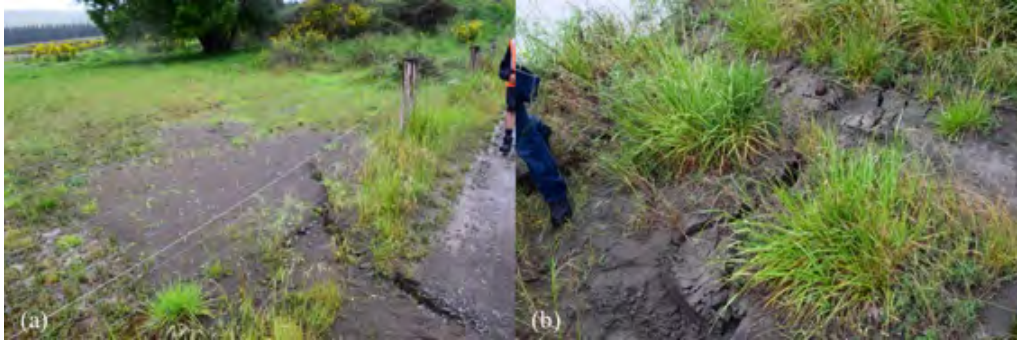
Surficial evidence of liquefaction at western approach to Waiiau River Bridge: (a) Ejecta and cracking adjacent to southern toe of approach embankment [-42.6558, 173.0297]; (b) Lateral spreading cracks near river bank [-42.6556, 173.0312].
